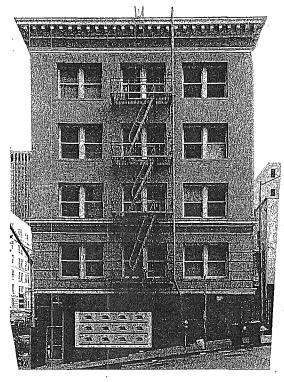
Photograph of Pine Street elevation with contemporary storefront at easternmost bay, and extant metal fire escape (photograph taken 01/26/2018).
